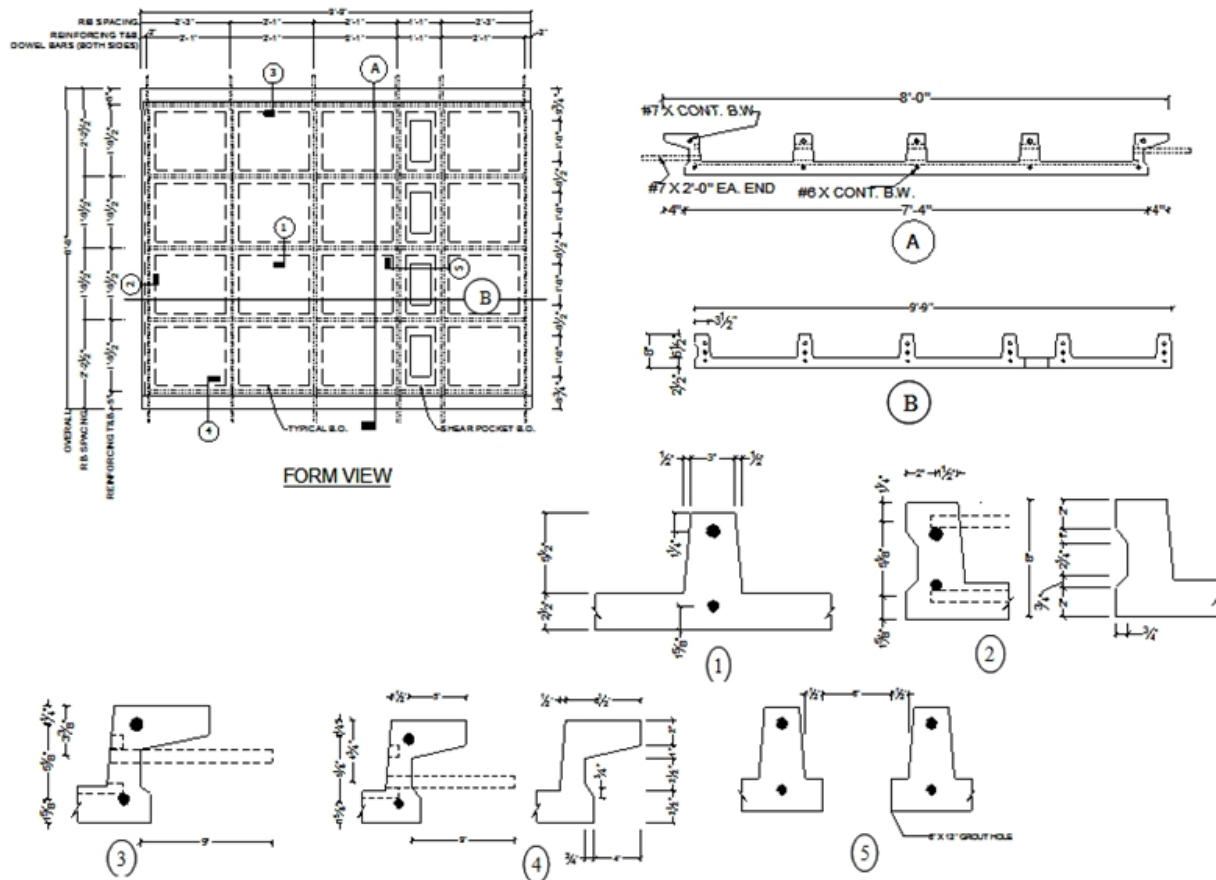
Reinforcement details of the UHPC waffle deck test panels
